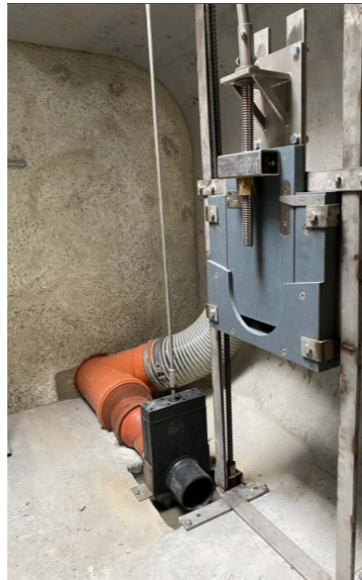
Outlet configuration in the ZEB-pilot stormwater tank. Source: Pedersen (2021)
